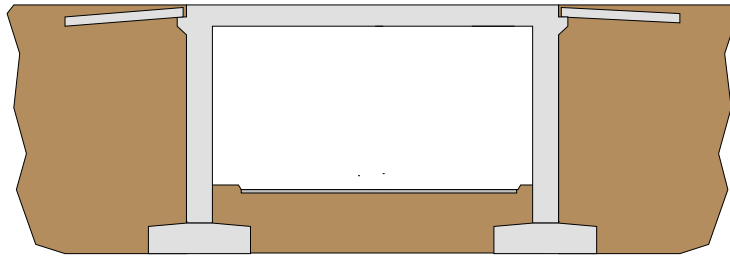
Typical section of an integral slab bridge (after Znidaric et al. 1998).
